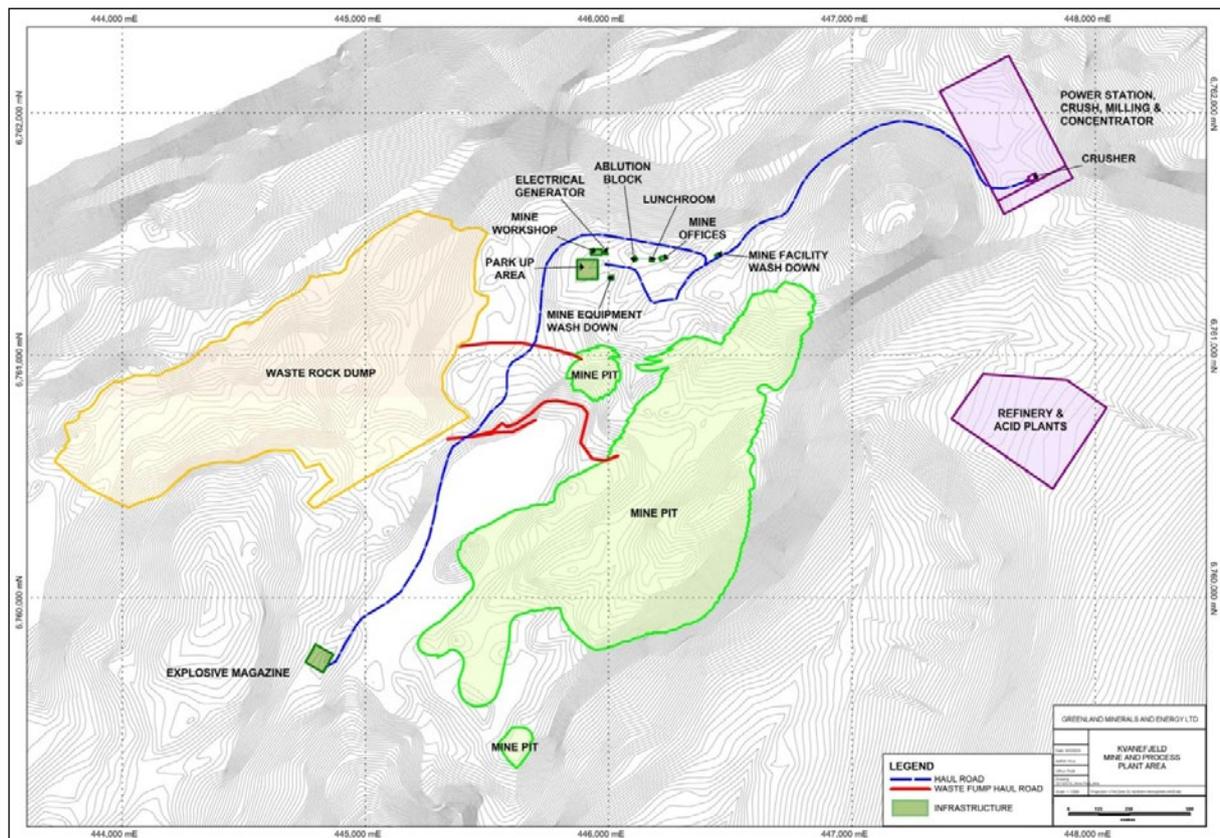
Plan of the Kvanefjeld area displaying the mine pit limits and facilities layout.
